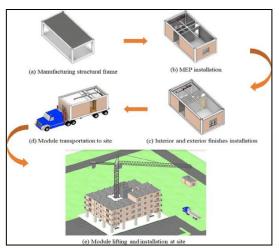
Steps of Modular Construction (source: Steel concrete composite systems for modular construction of high-rise buildings by Y.S. Chua)
